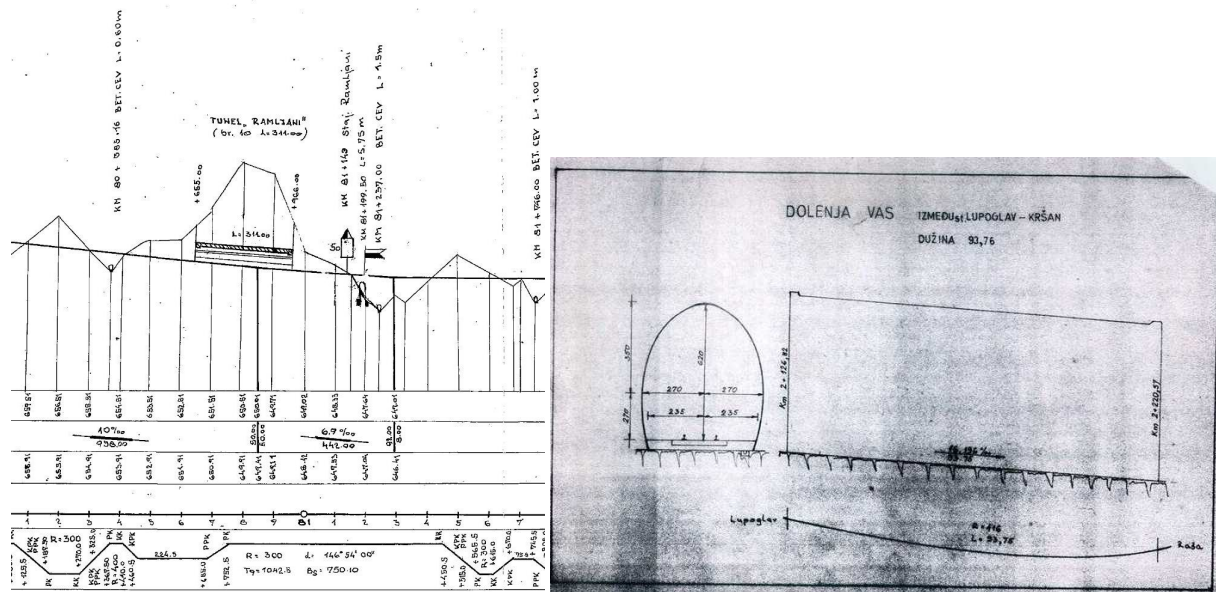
Existing analogue documentation, longitudinal section of the railway section, longitudinal section of tunnel
